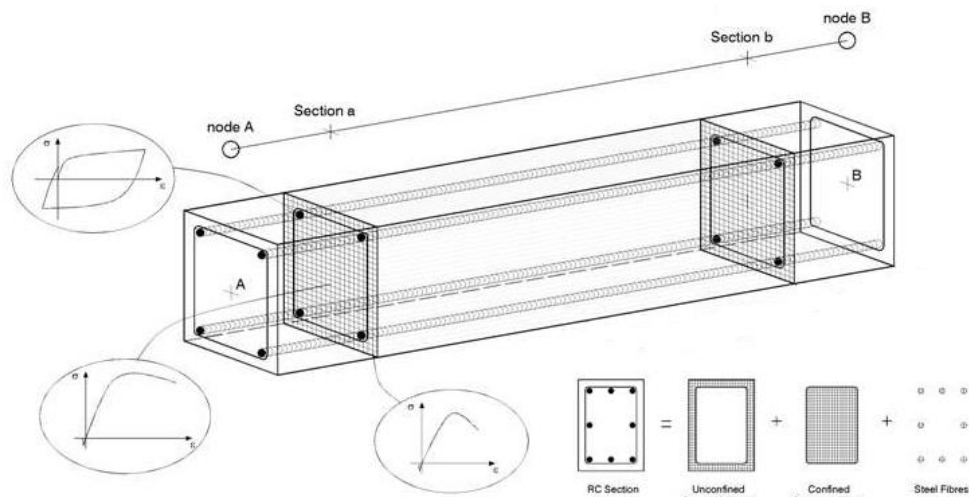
Typical reinforced concrete fibre element member (Seismosoft User Manual, 2020, p. 297)
